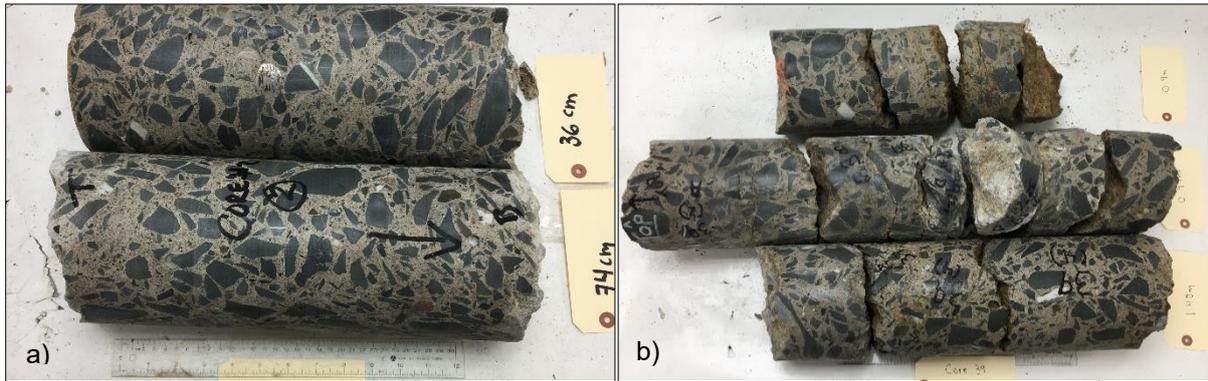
a) Core 2, from Diversion Spillway; b) Core 39, from Intake Structure, Unit 6 over Penstock
